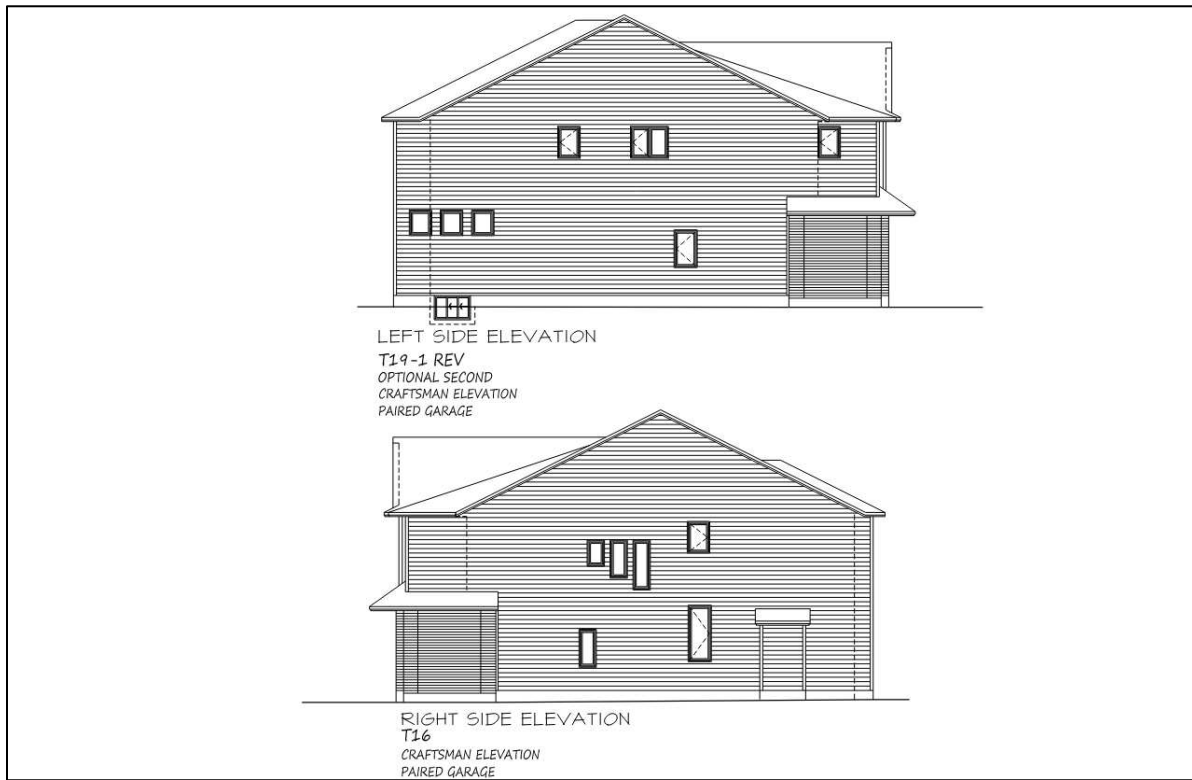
Left and right side Craftsman townhouse dwelling elevations prepared by Tamarack Homes.
